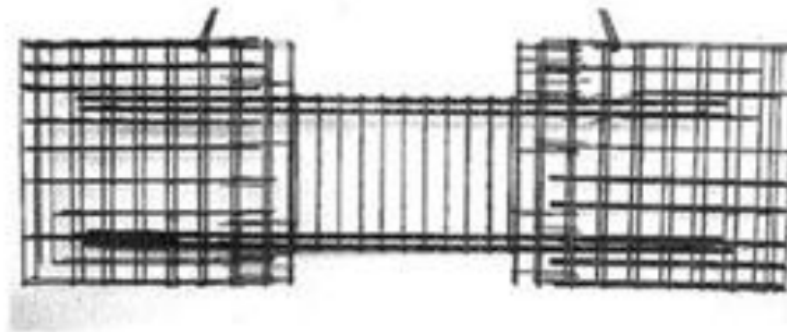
Typical Layout of Conventionally Reinforced Coupling Beam [1].
